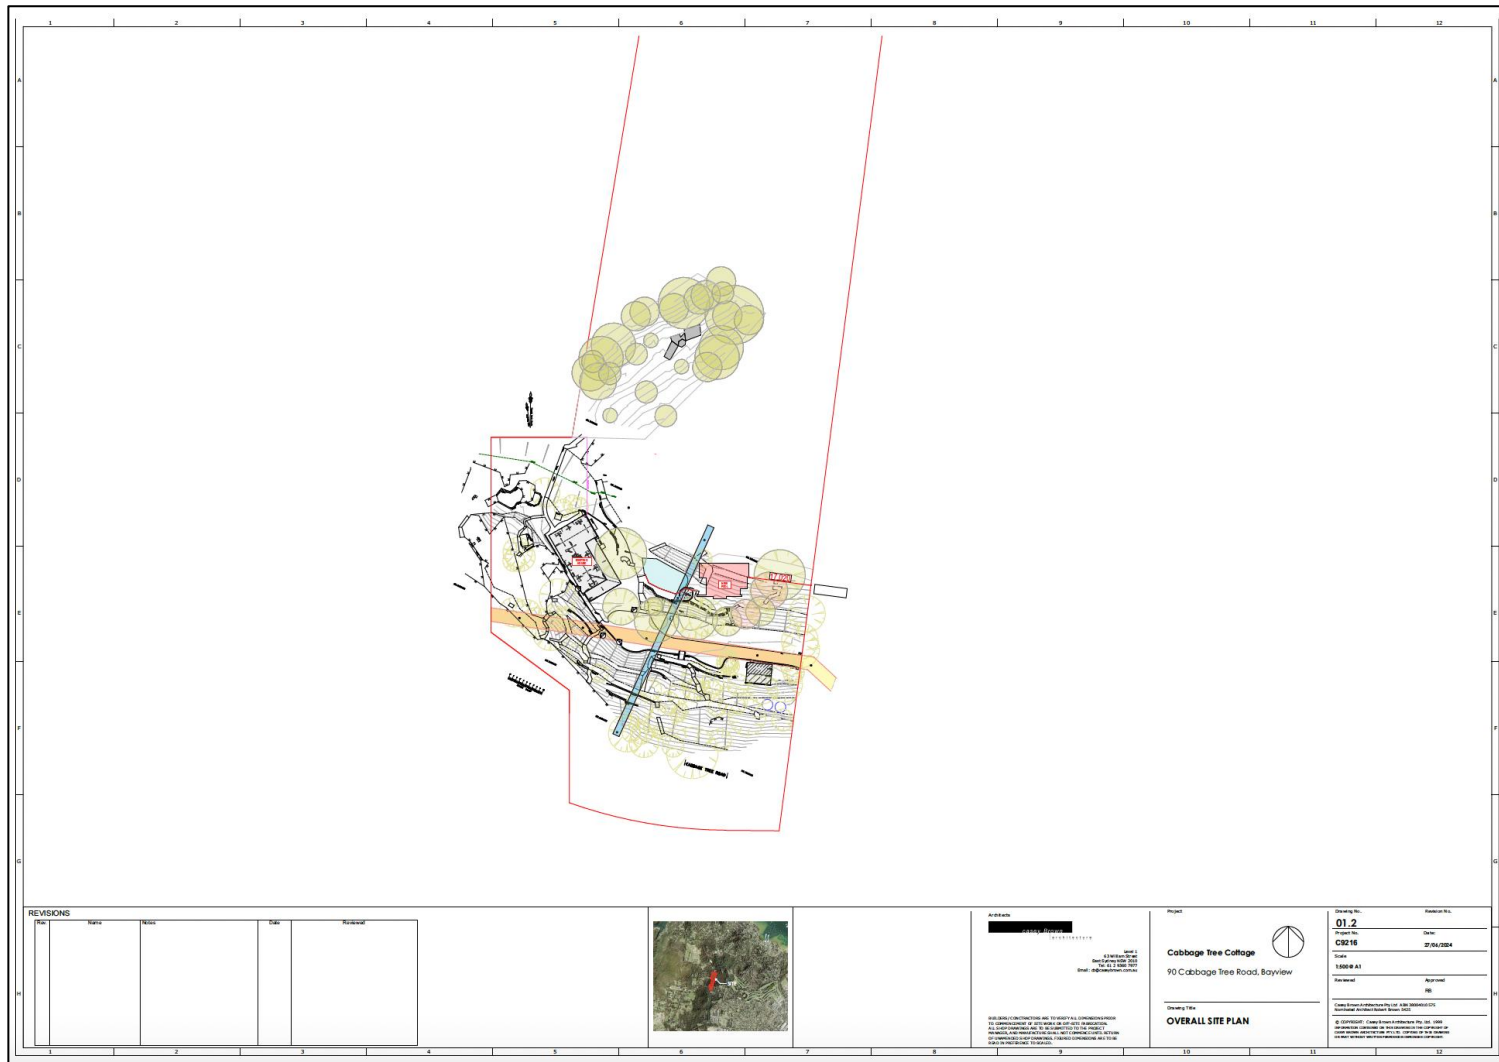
ILLUSTRATES PROPOSED SITE PLAN
